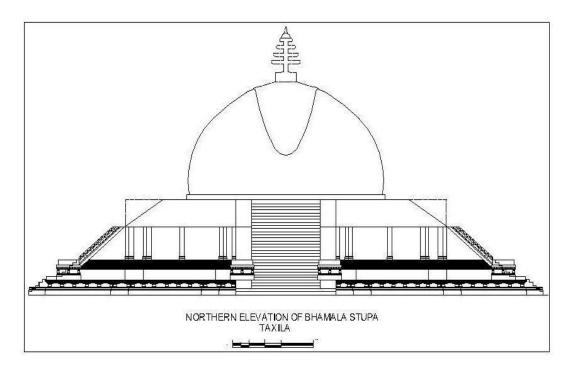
Bhamala Excavations 2014-15: Northern Elevation of the Main Stupa
